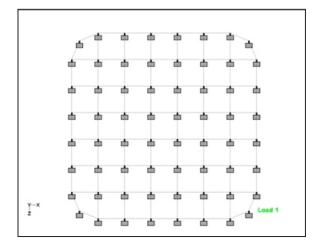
Top view of Square structures with rounded corners without shear walls.
